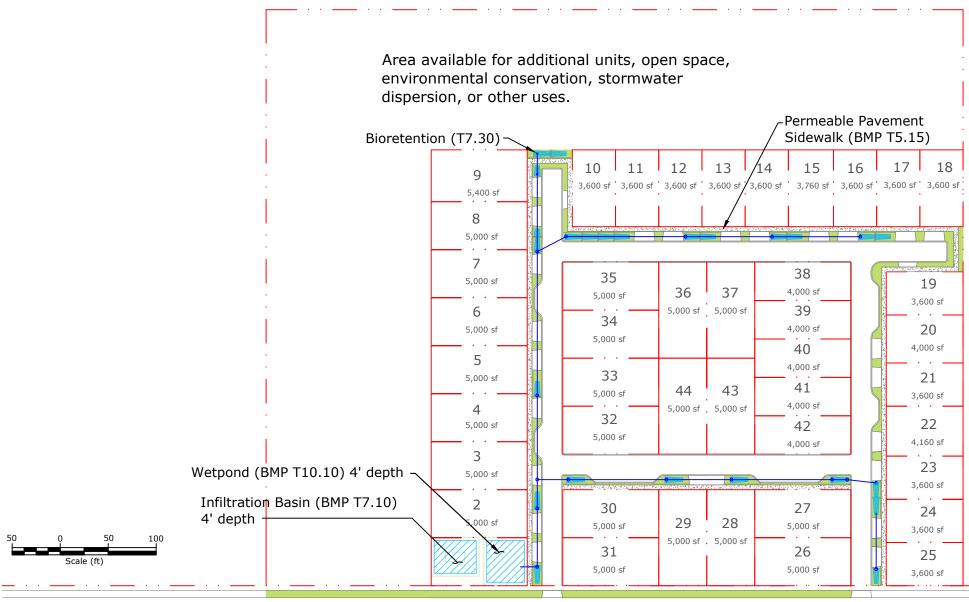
Scenario 4. Permanent Stormwater Site Plan - Typical Single-Family Residential Parcel, 2012 Requirements, Till Soils
